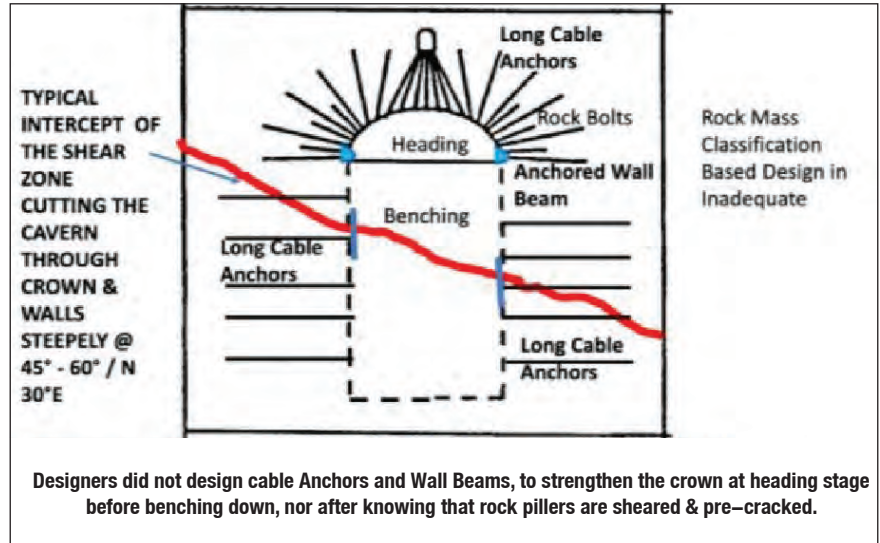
The methodology needed providing Long Cable Anchors & Wall Beams
